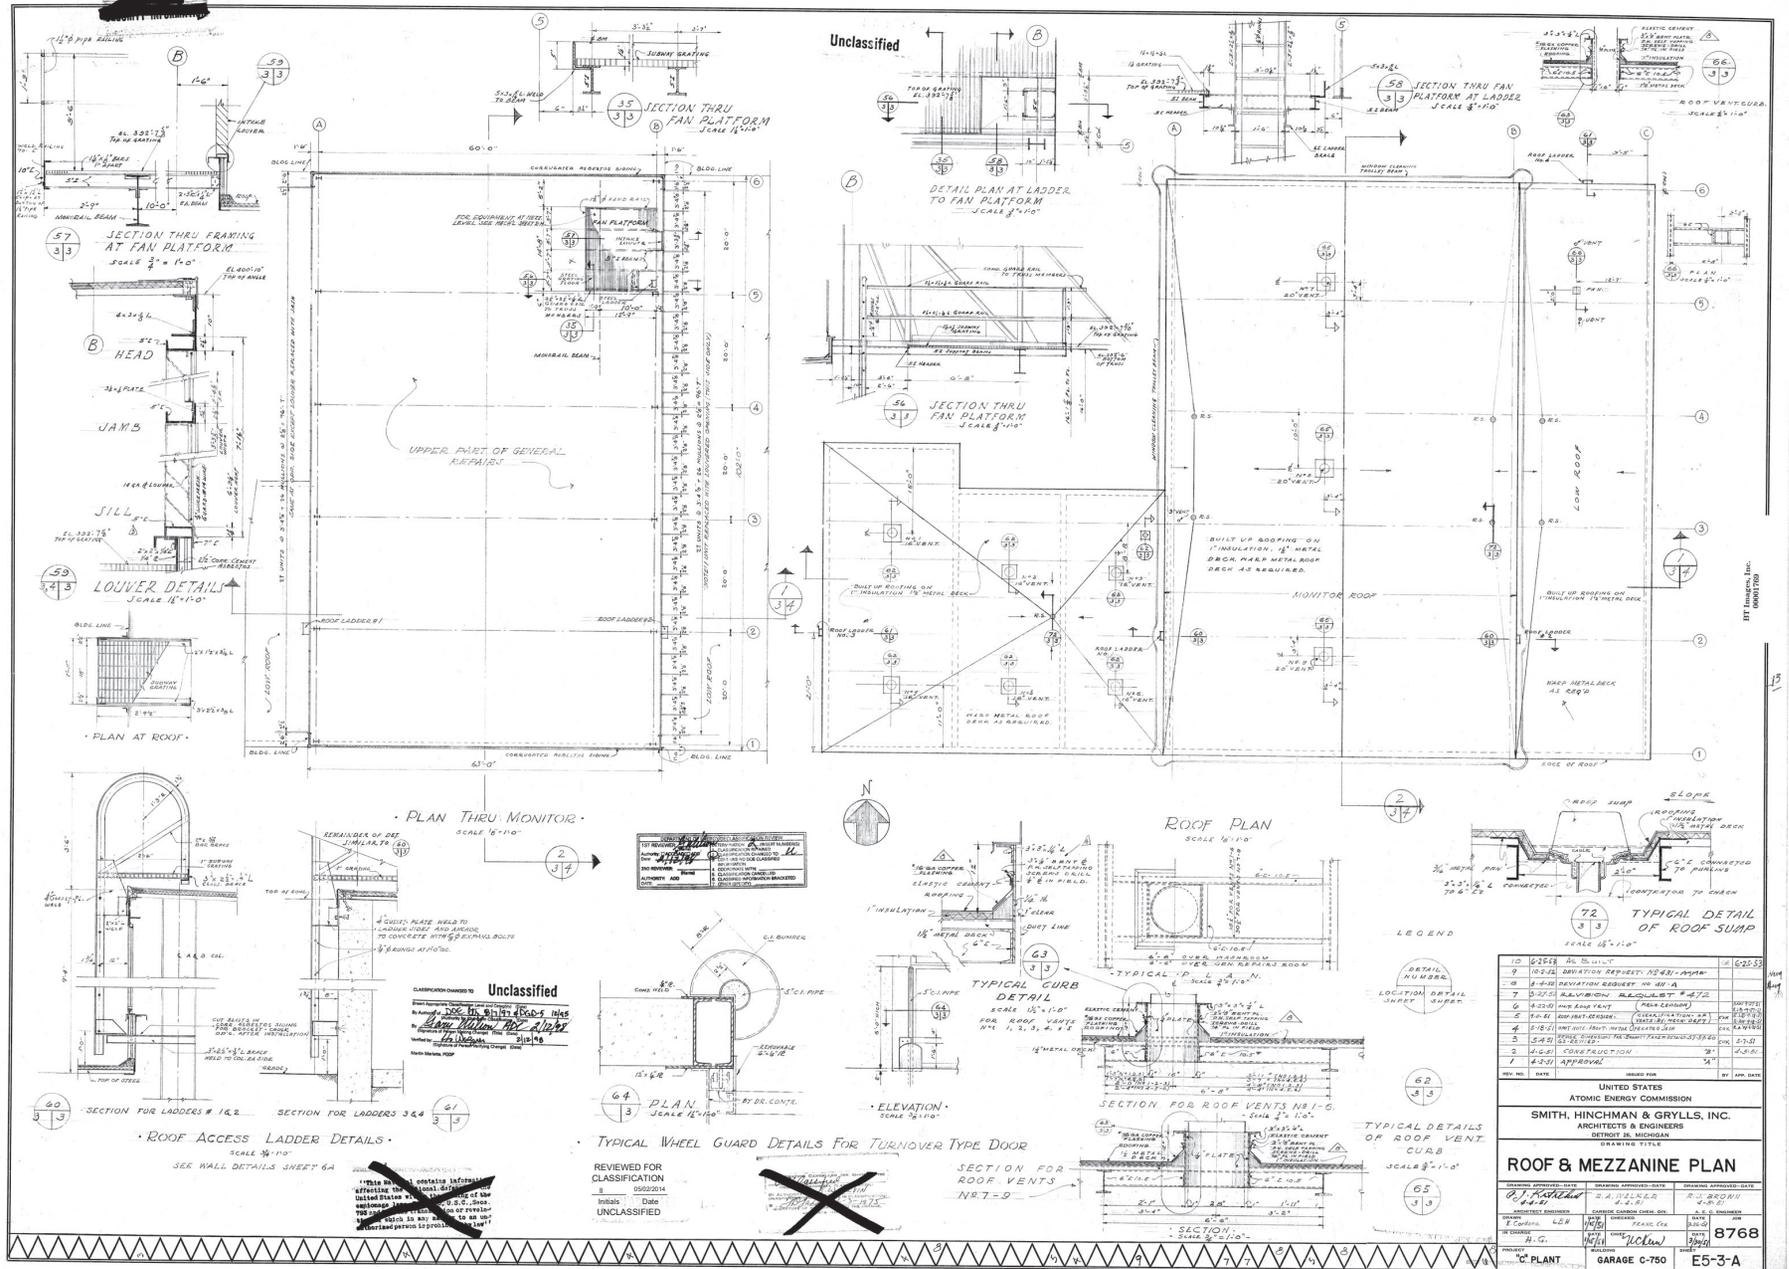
Engineering Drawing E5-3-A_0001_0010_U-017135
